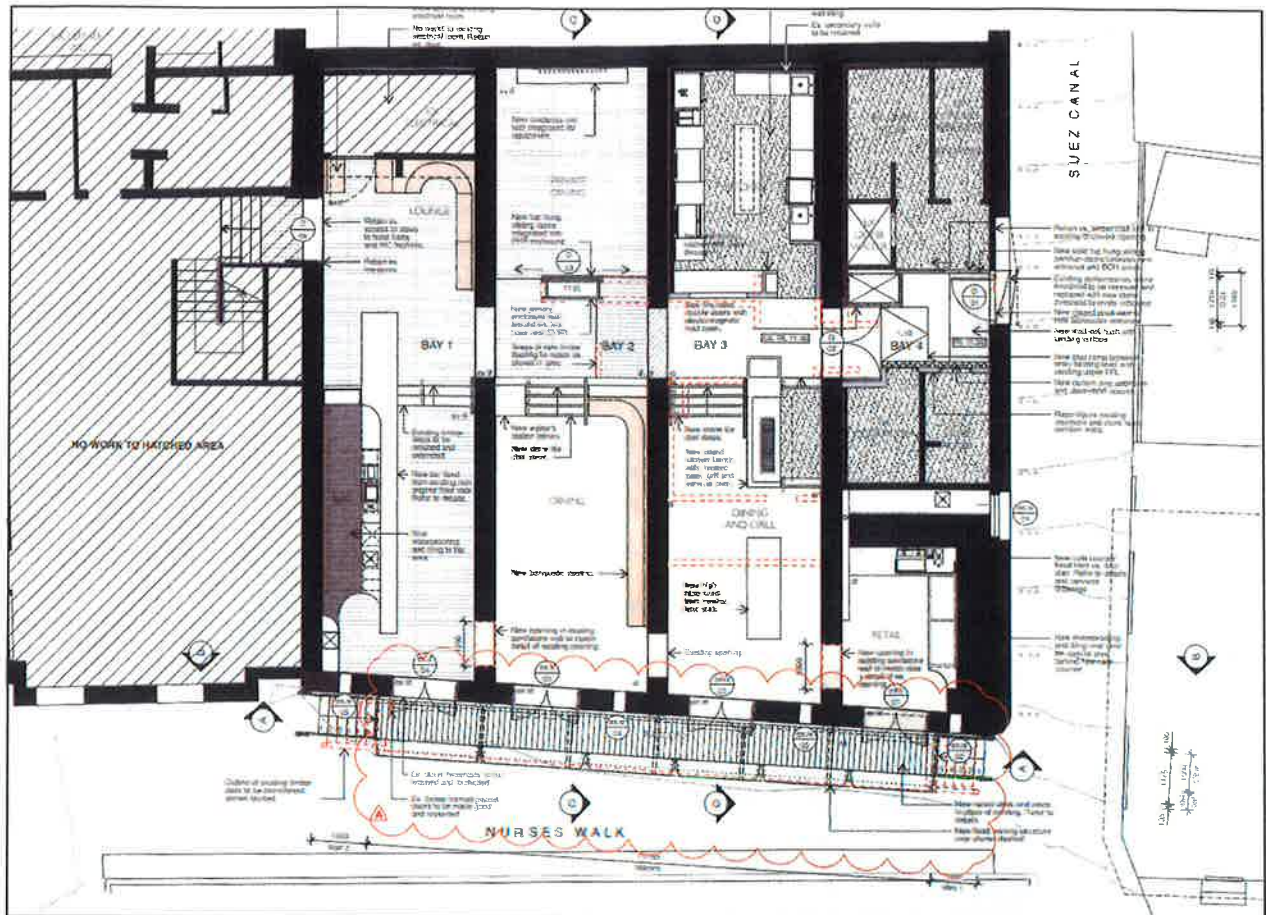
Proposed lower ground floor/basement plan (Source: Applicant's RtS).
